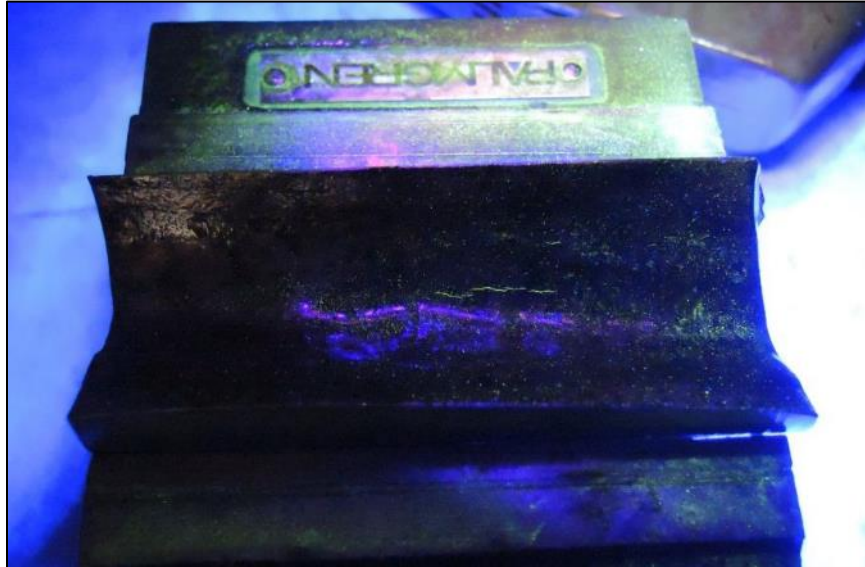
Representative image of the flange weld access hole surface of core sample D-NE following wet fluorescent magnetic particle testing showing microcracks.
